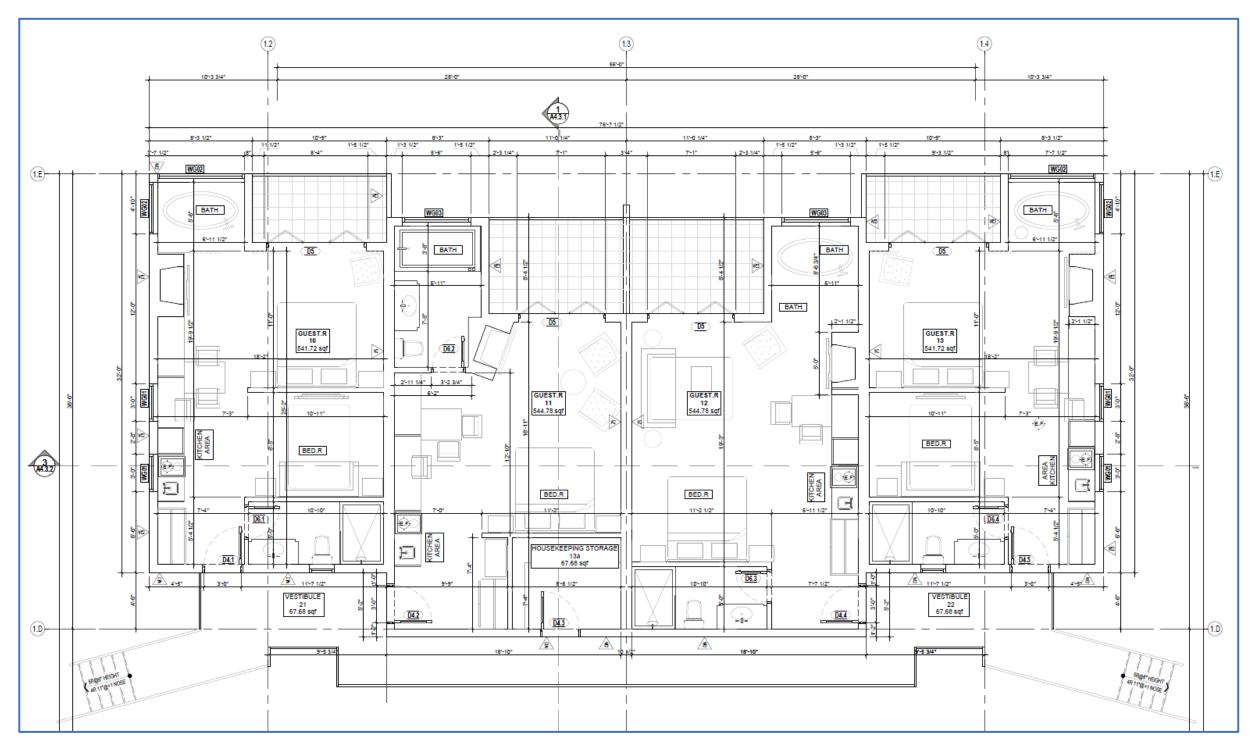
Lower floor of the Centre wing in the *Proposed Development* (refer to Building 2 in Figure 3 for a 3D rendering of the structures). This floor will house guestrooms closer to the shoreline. *Image modified from HNPA Architecture+Planning Inc. by Coastal Raintree Consulting, Ltd.
